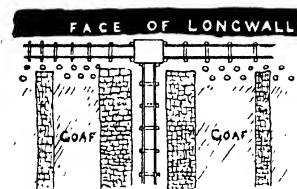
Longwall. Plan showing Packs, &c., and Trainroad laid along Face
